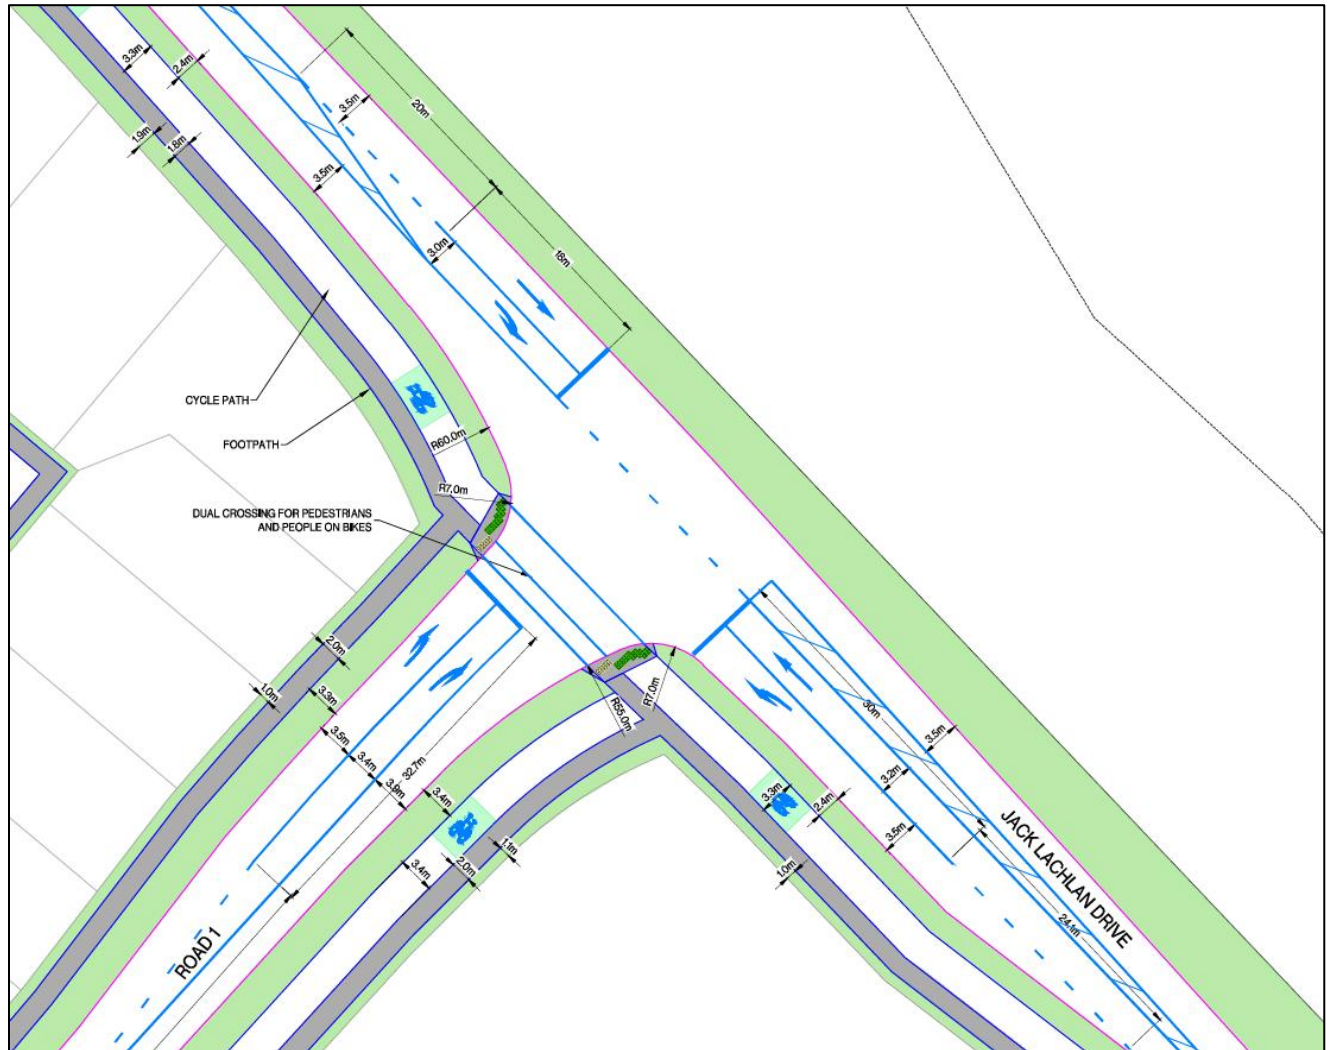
Road 1 / Jack Lachlan Drive intersection
